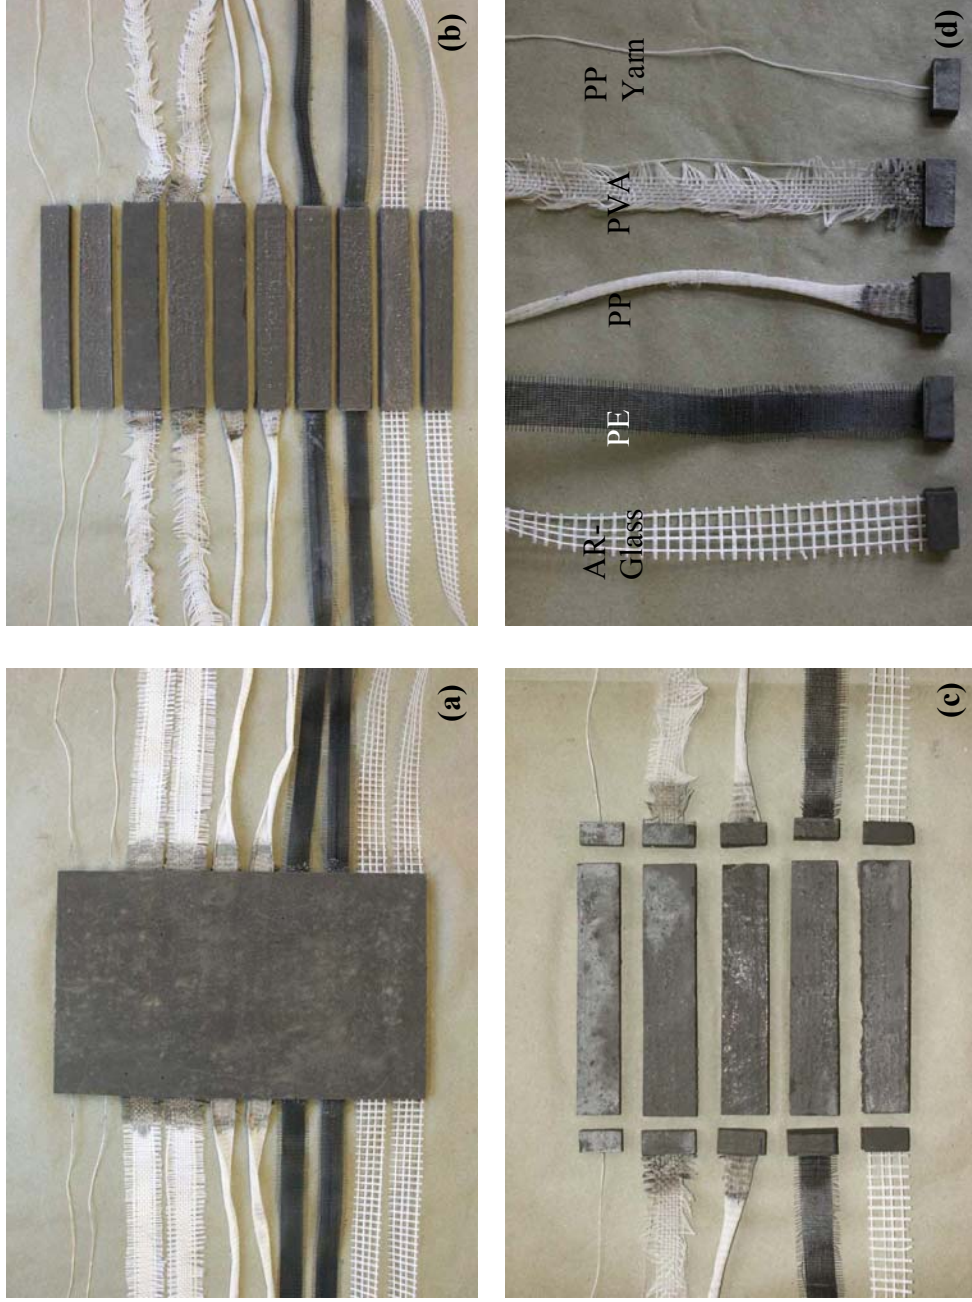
Specimens (a) Sample taken out from the mold (b) & (c) Cut into specific size (d) Each sample
